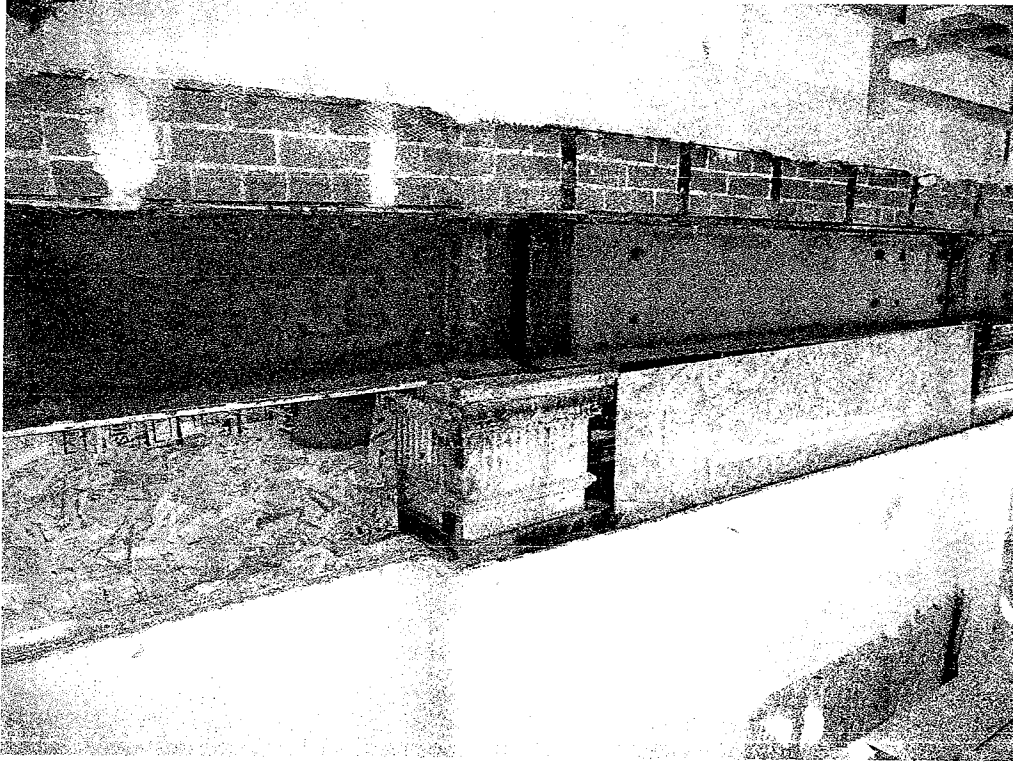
View looking north at existing steel beams located at grid A/6.
